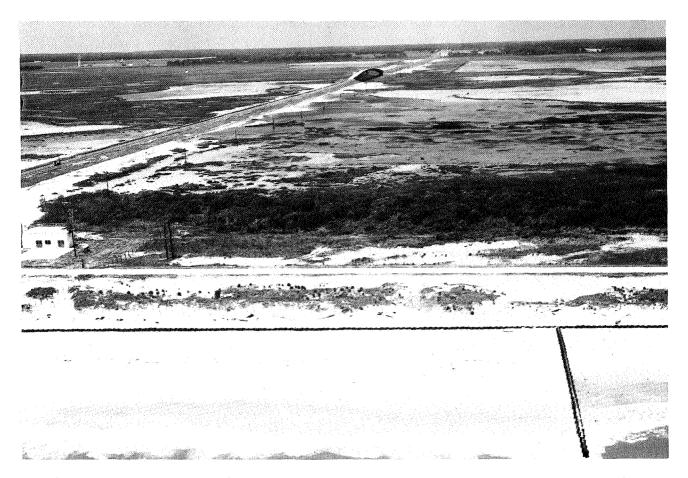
Aerial view of Wallops Island, showing causeway to mainland, one of the groins, and part of the extended seawall.
